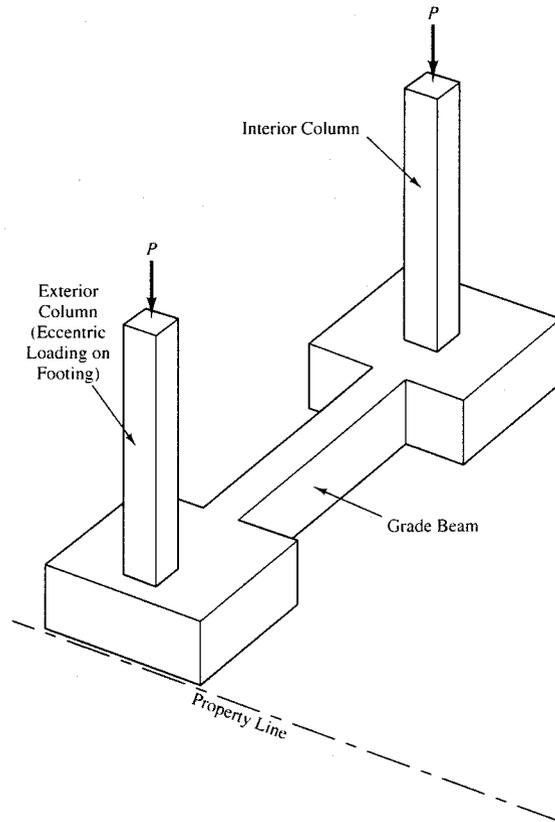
Use of a strap footing to support exterior columns when construction cannot extend beyond the property line.
